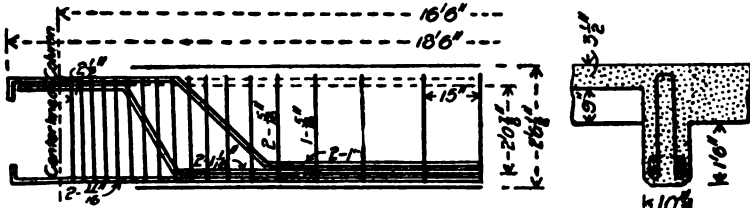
Column and Floor Construction, Bush Terminal Co.'s Factory.
